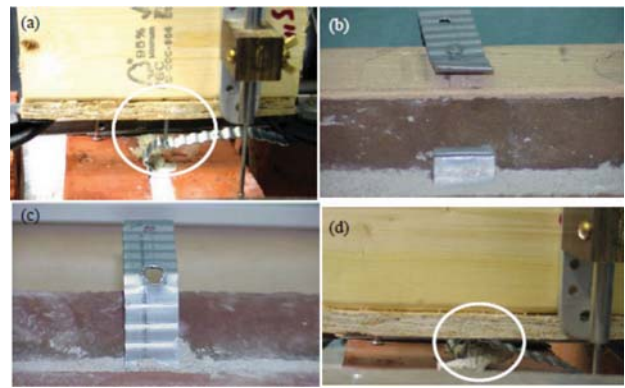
Common tie connection failure modes under cyclic tension-compression loadings: (a) nail pull-out from wood stud, (b) tie fracture, (c) push through of nail or screw head, and (d) buckling of tie (Reneckis and LaFave, 2009).
